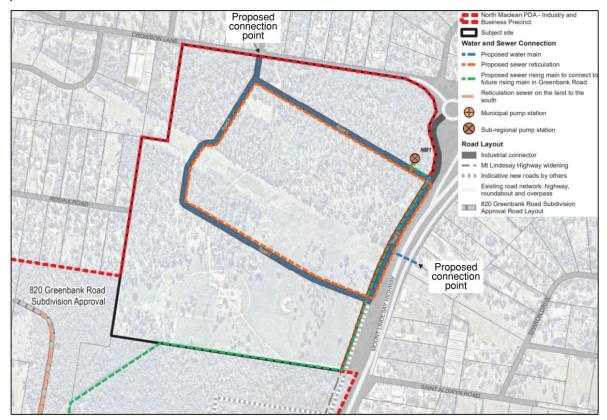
Endorsed EDQ Water & Sewer Context Plan
